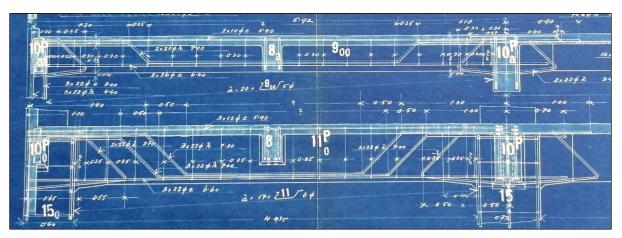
Reinforcement details of a secondary (above) and primary beam (below) – end span in longitudinal direction [5]
